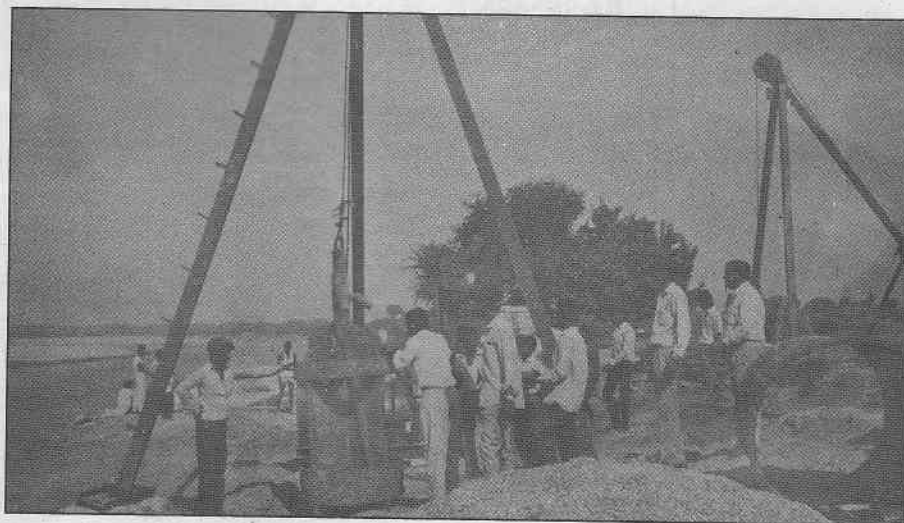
DMC Chisel Used Construction Of 1m Diameter Cast-In-Situ Piles.
